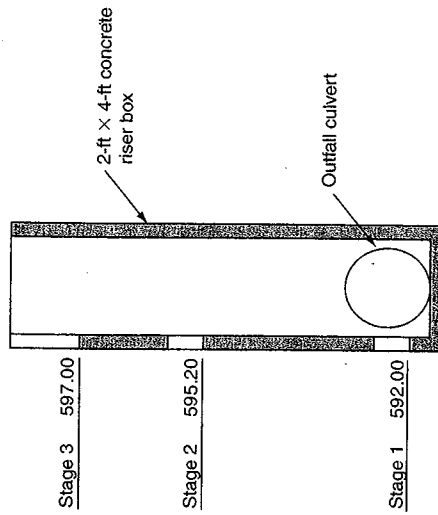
Schematic drawing of the three-stage outlet structure of Example 12.4.
